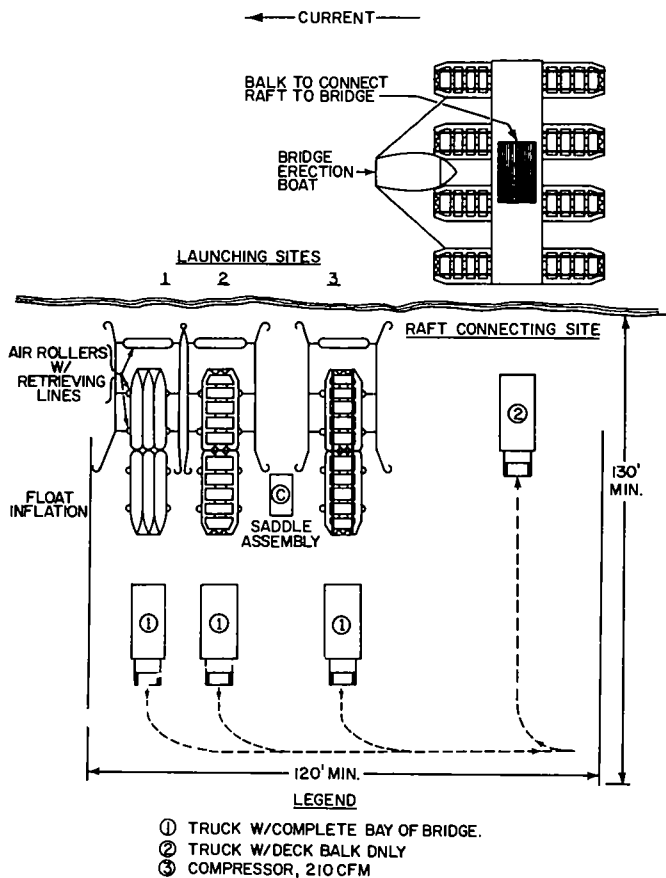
Typical layout of assembly area in M4T6 bridge construction.
